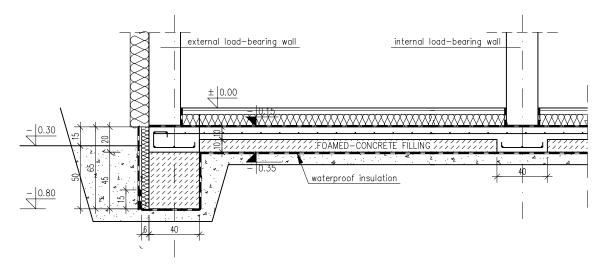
Foundation slab for poor geotechnical conditions. Standard version
